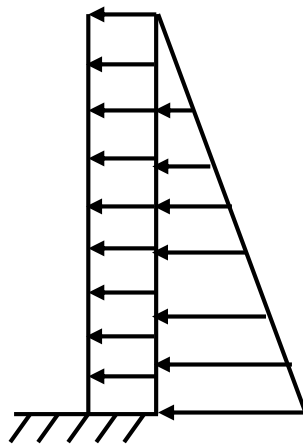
Foundation wall loading due to surcharge and soil pressure.
